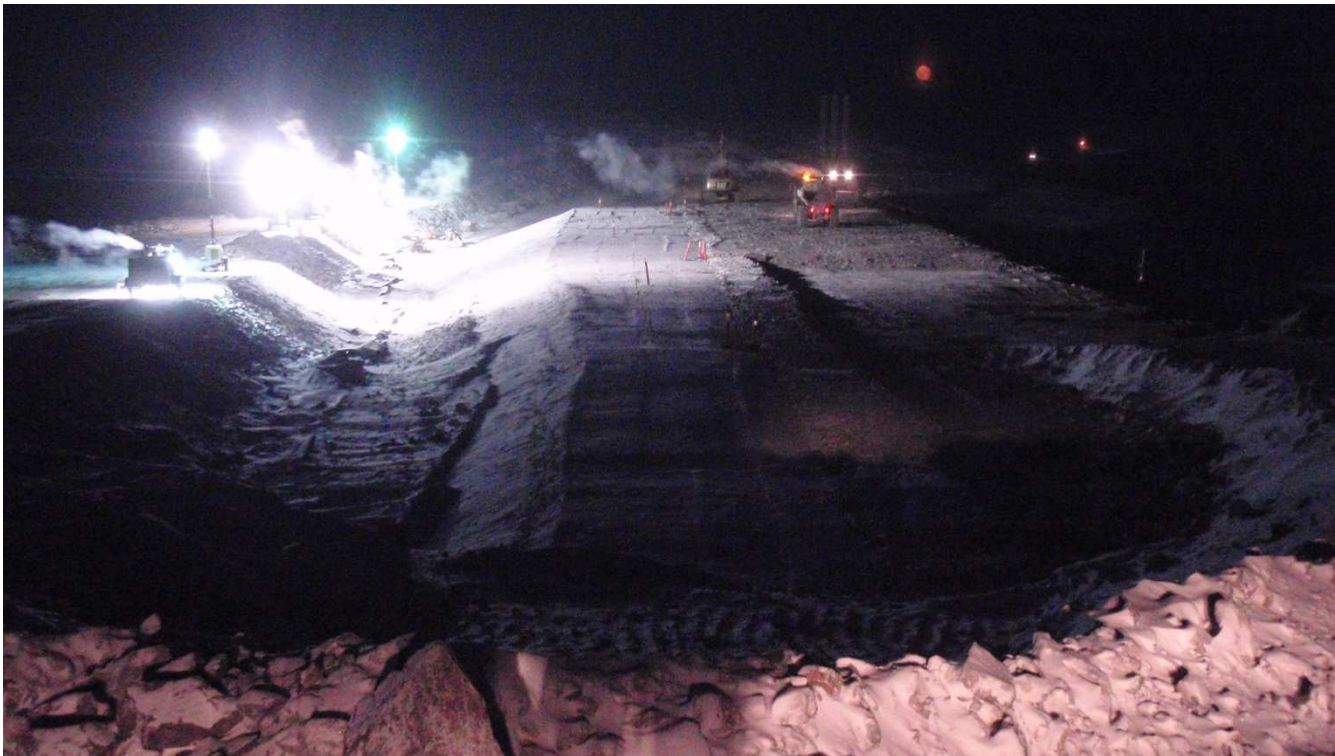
Placing and spreading FCM by hand around the fillet expansion at station 0+60 to 0+70, ~ SW view.
